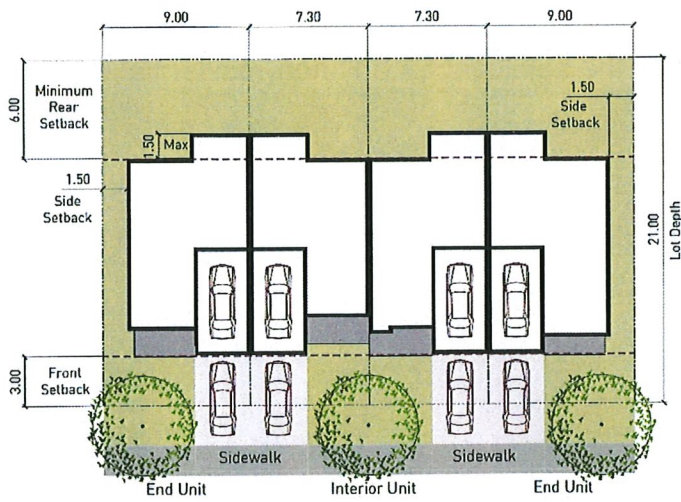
24' Standard Townhome Lotting Standard and Measurements
